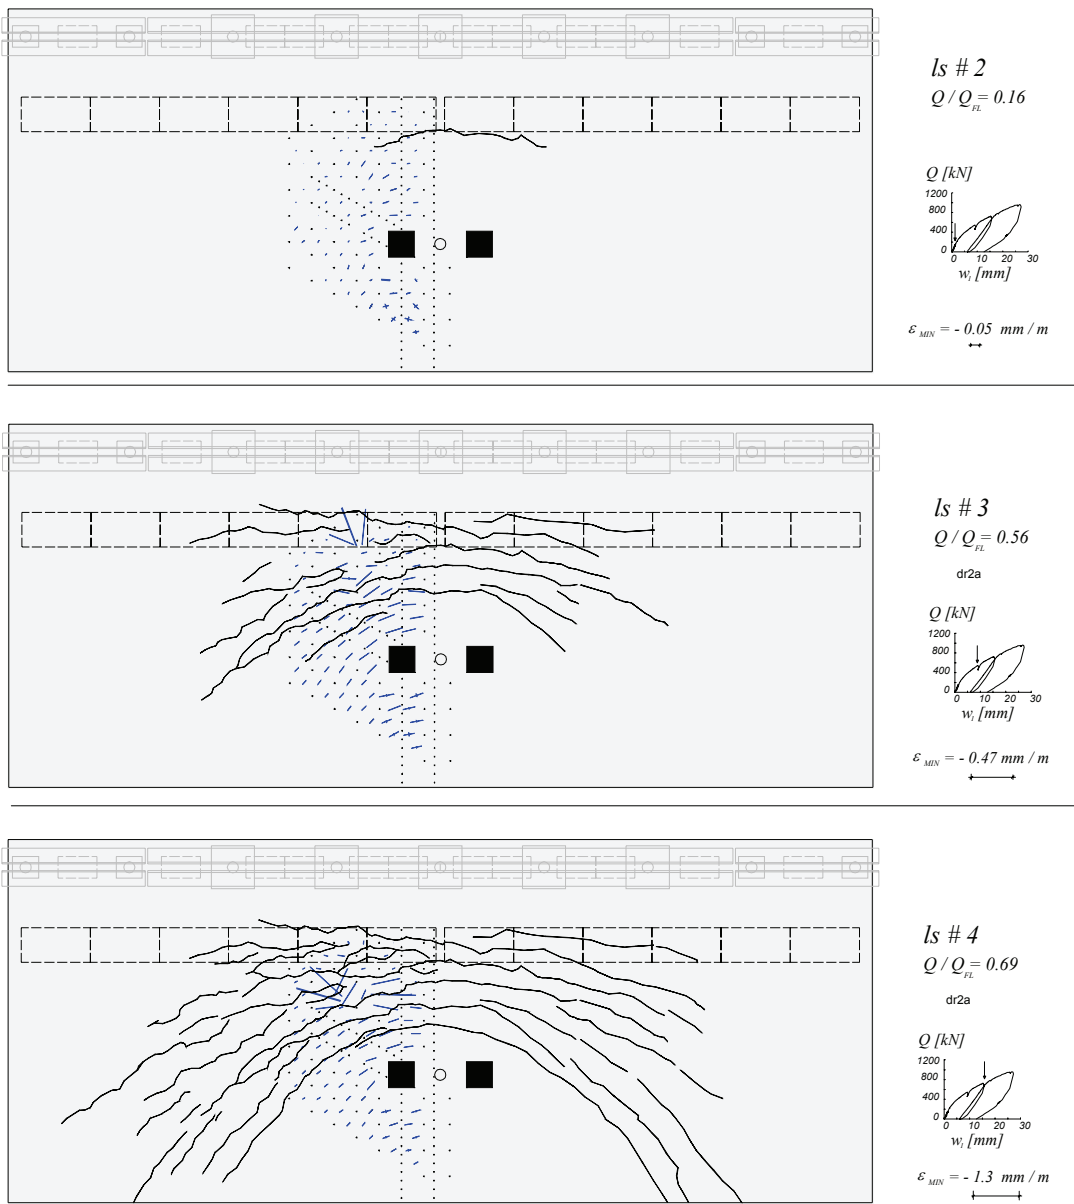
Test DR2-a: Crack pattern and compressive principal strains on the top surface
